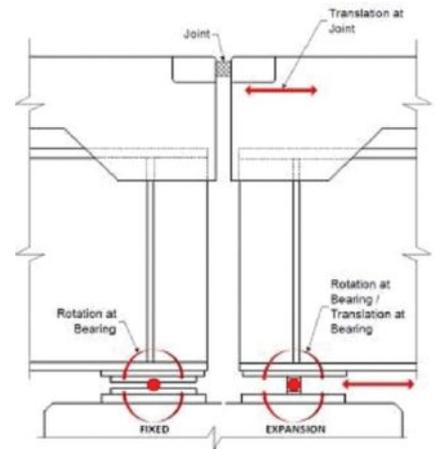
Typical deck joint at pier with movements indicated at deck and bearings.
